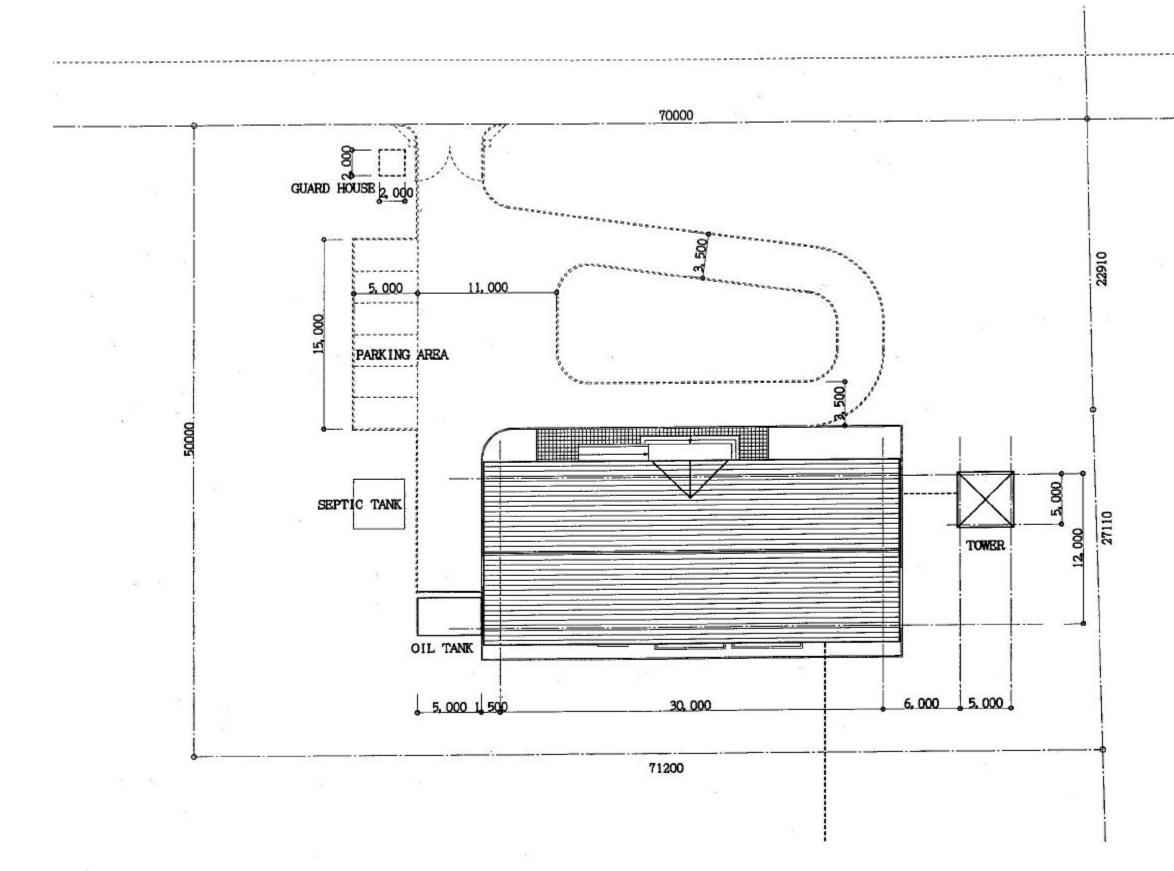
Kunduchi Transmitting Station Building / Site Layout Plan S=1/300
